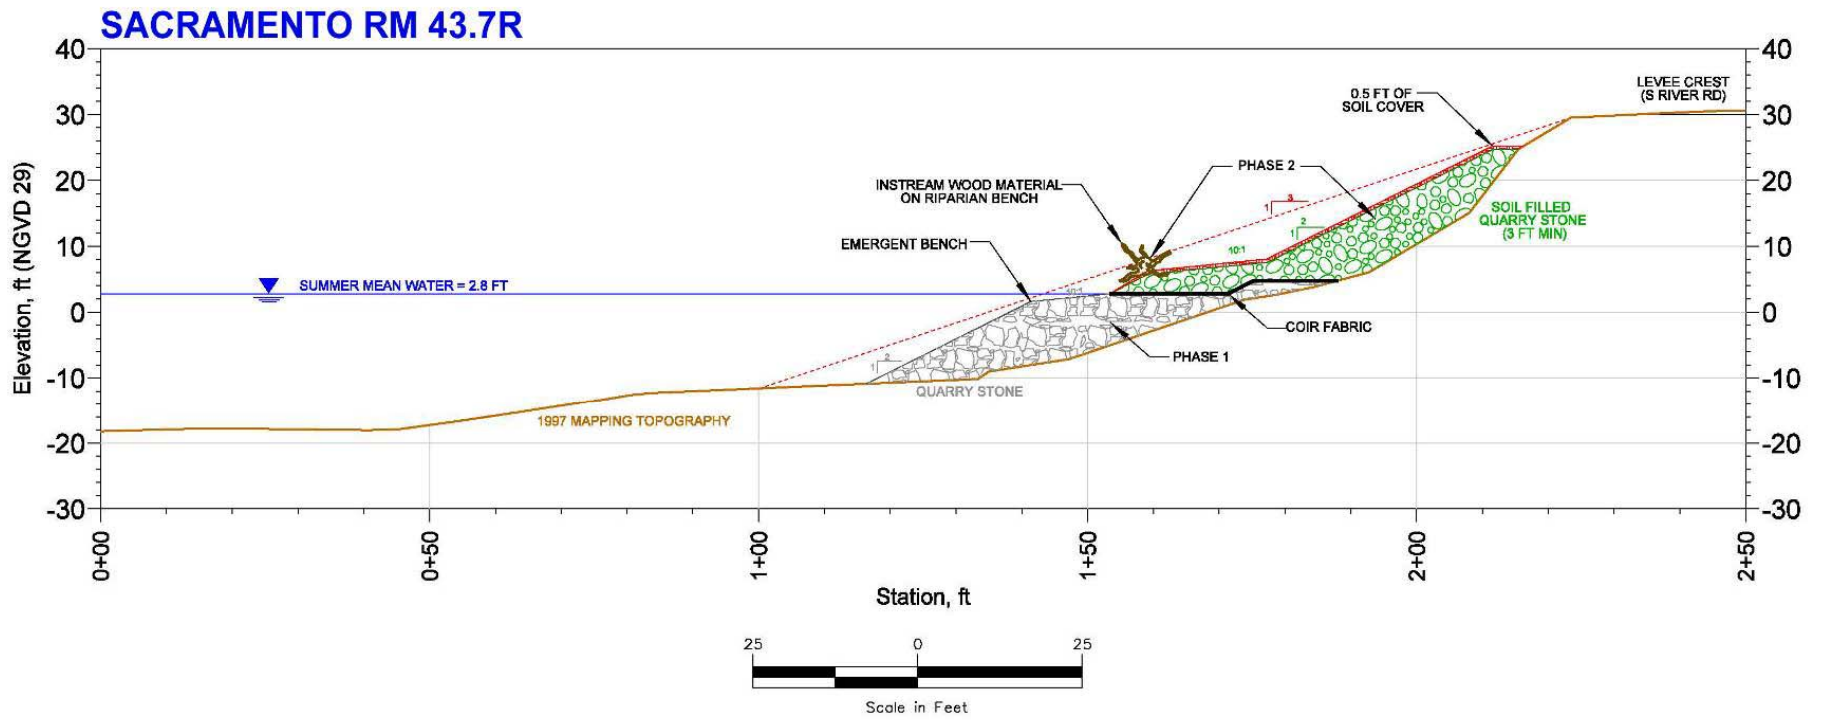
Conceptual cross section of Site RM 43.7R. Ayres Associates, Sacramento, CA, 8 November 2006.
